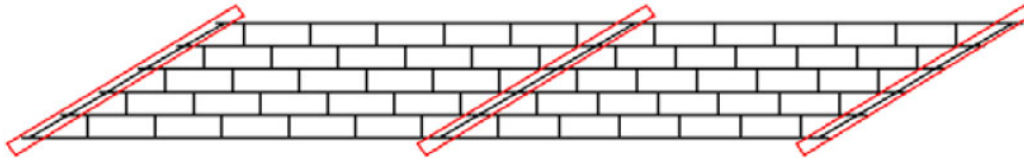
Recommended staggered framing arrangement for straight skewed bridges with parallel skew angles at bearing lines (NSBA, 2016).
